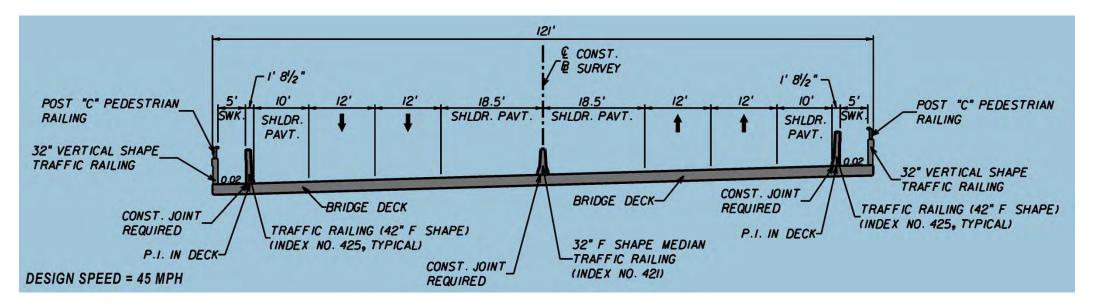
Proposed Typical Section-Center Alignment, Parallel to the Ibis Preserve
